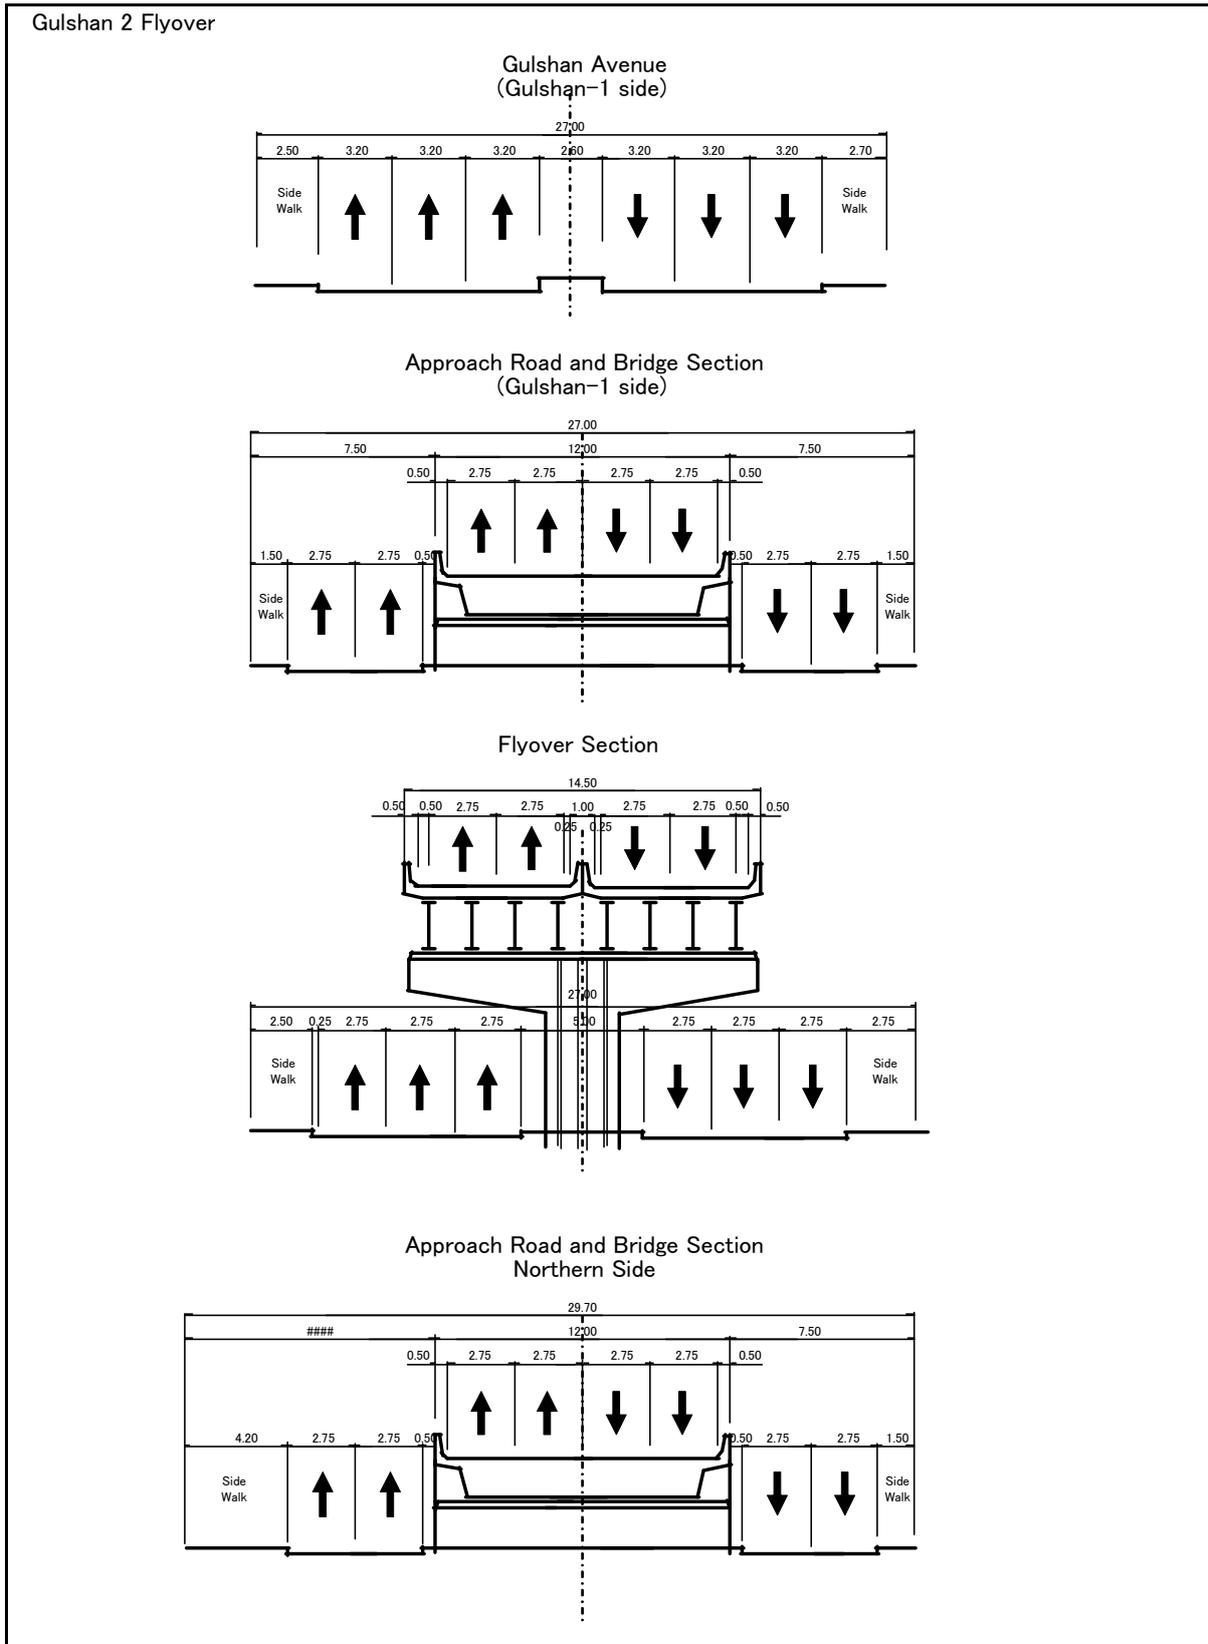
Typical Cross Section of Gulshan-2 Flyover Plan
